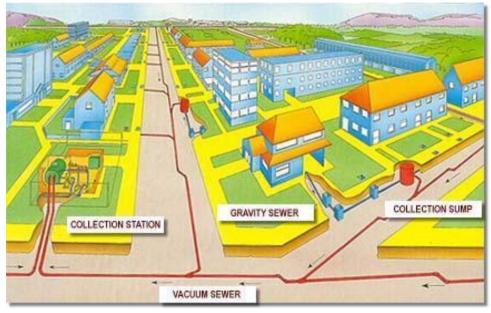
Typical Scheme Layout Diagram provided by Flovac Pty Ltd
